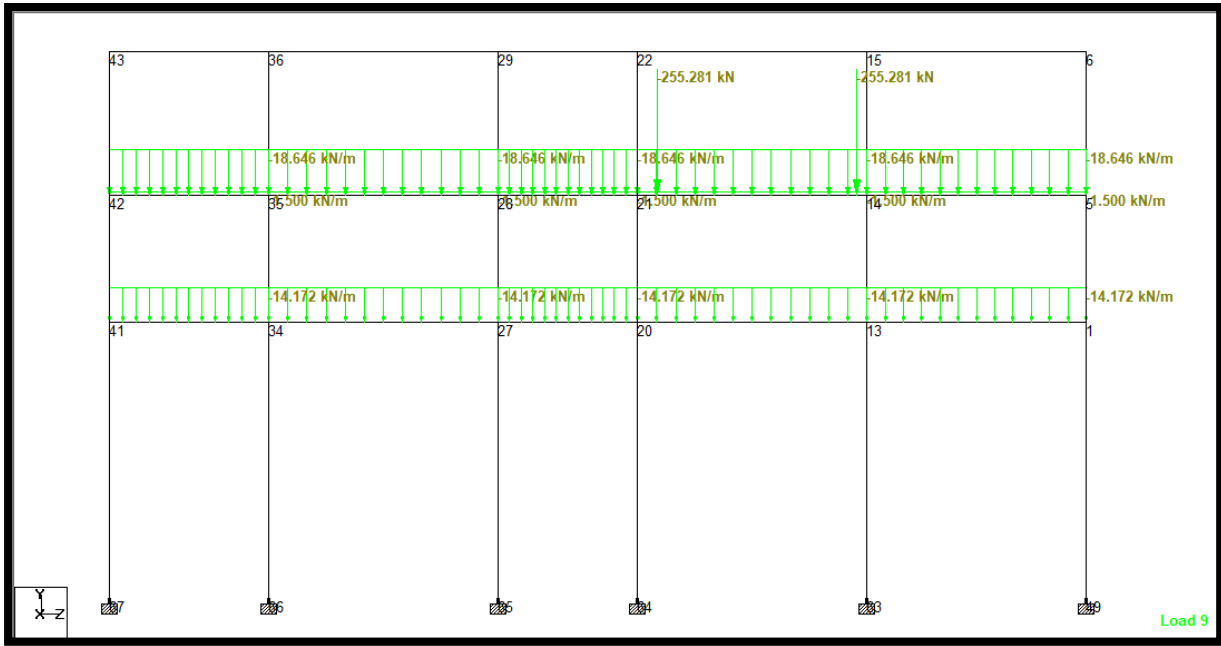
15 Load acting on crane beam (1.5 DL+ 1.05 CL3)
